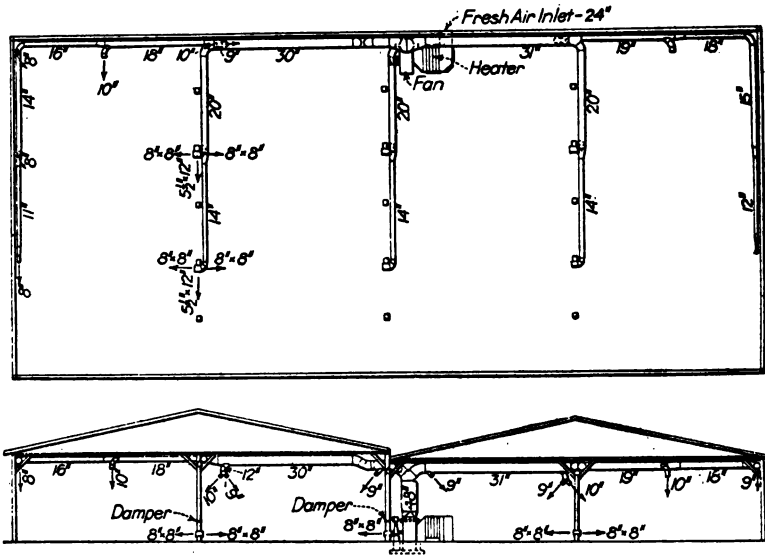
TYPICAL FAN-BLAST INSTALLATION FOR A FACTORY
